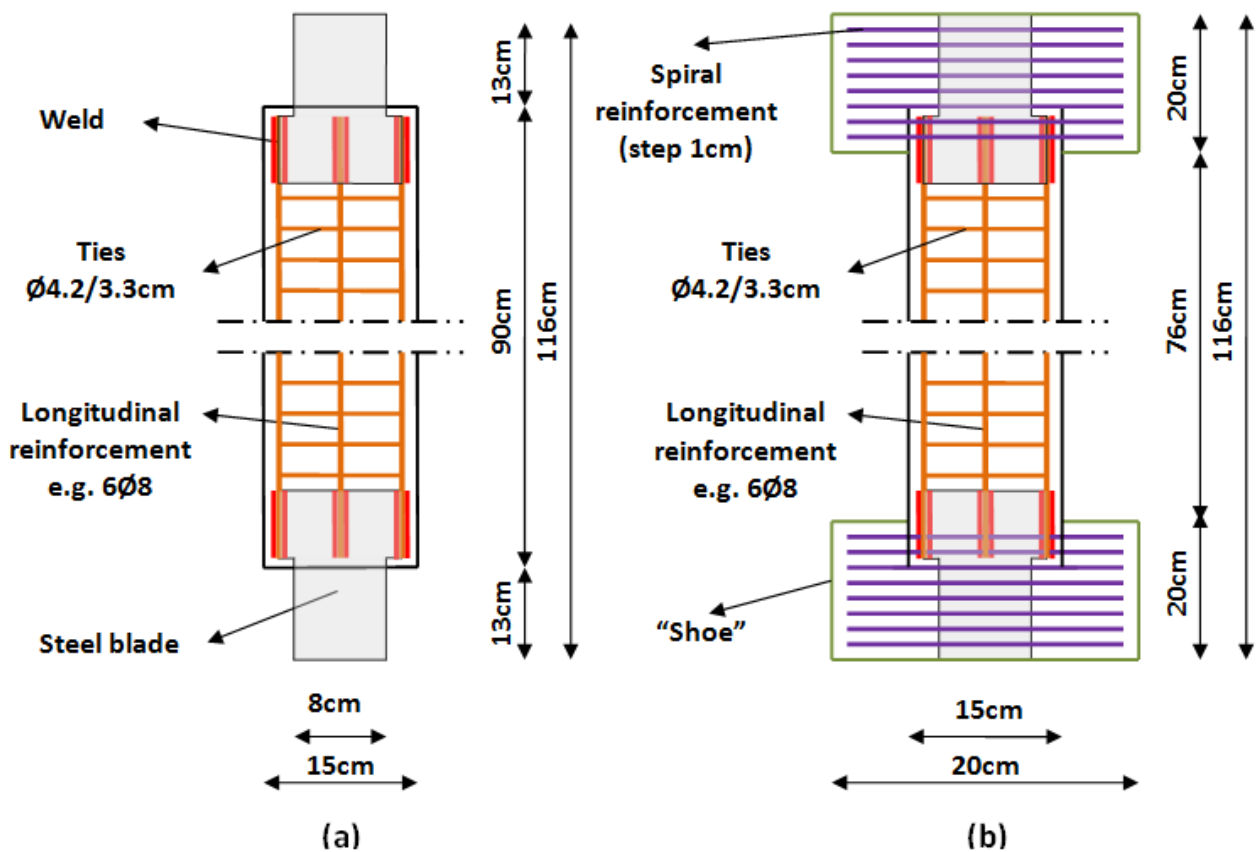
Sketch of front view of specimens for: (a) tension, (b) compression. (Reinforcement differs for each specimen. Example shows a typical longitudinal reinforcement 6Ø8.)
